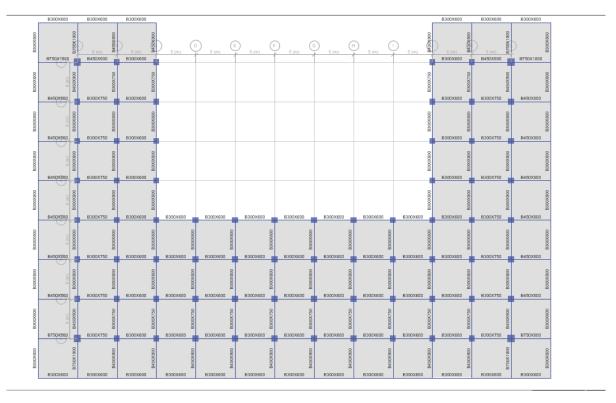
Unsymmetrical structure plan storey 9 & above.
